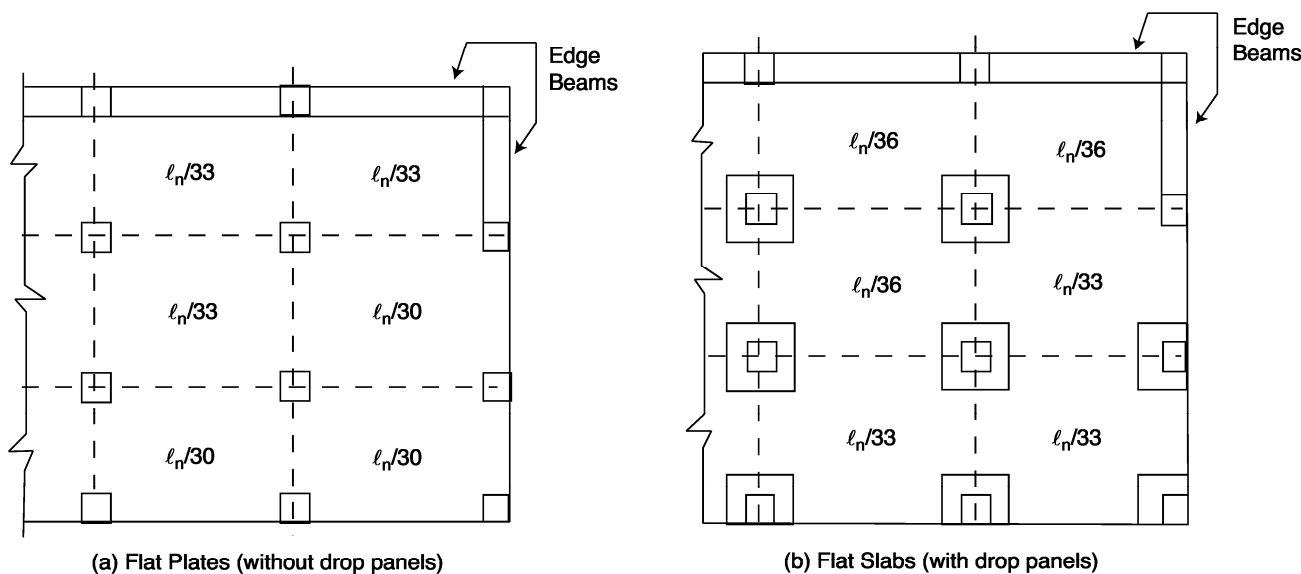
Minimum Thickness of Slabs without Interior Beams (Grade 60 Reinforcement)
